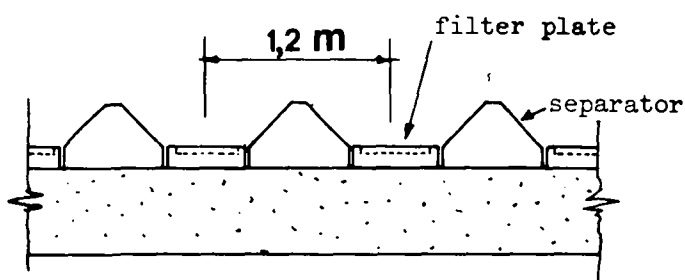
CROSS-SECTION OF TANK BOTTOM WITH RIDGE-AND-FURROW DIFFUSER ARRANGEMENT
